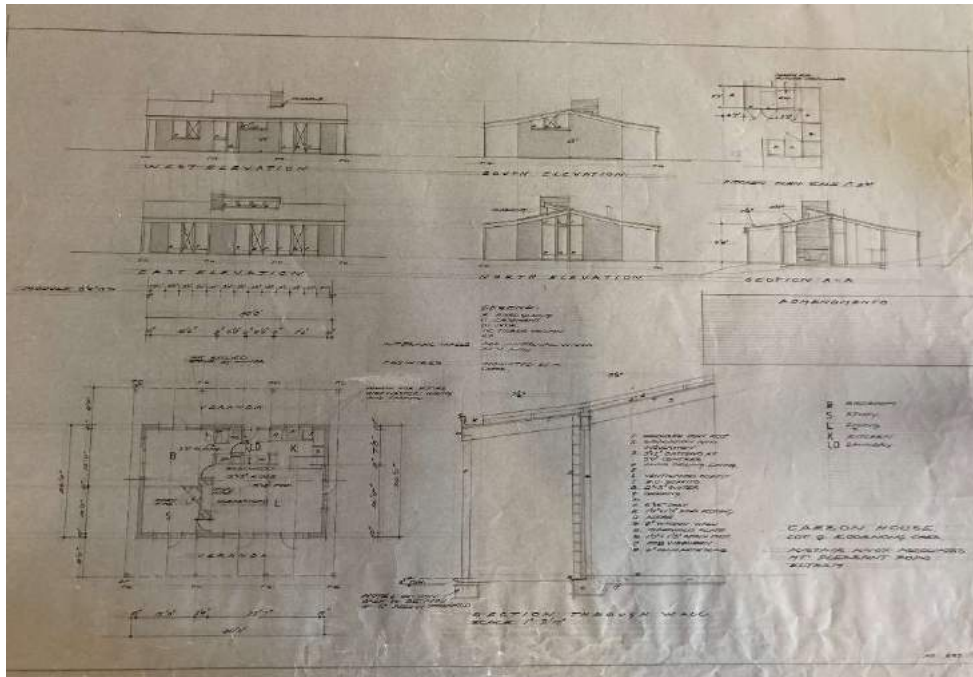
Architectural drawing dates 1972 shows the design of Alistair Knox. The house was a simple rectangular built form. Source: Alistair Knox Collection, State Library Victoria.
